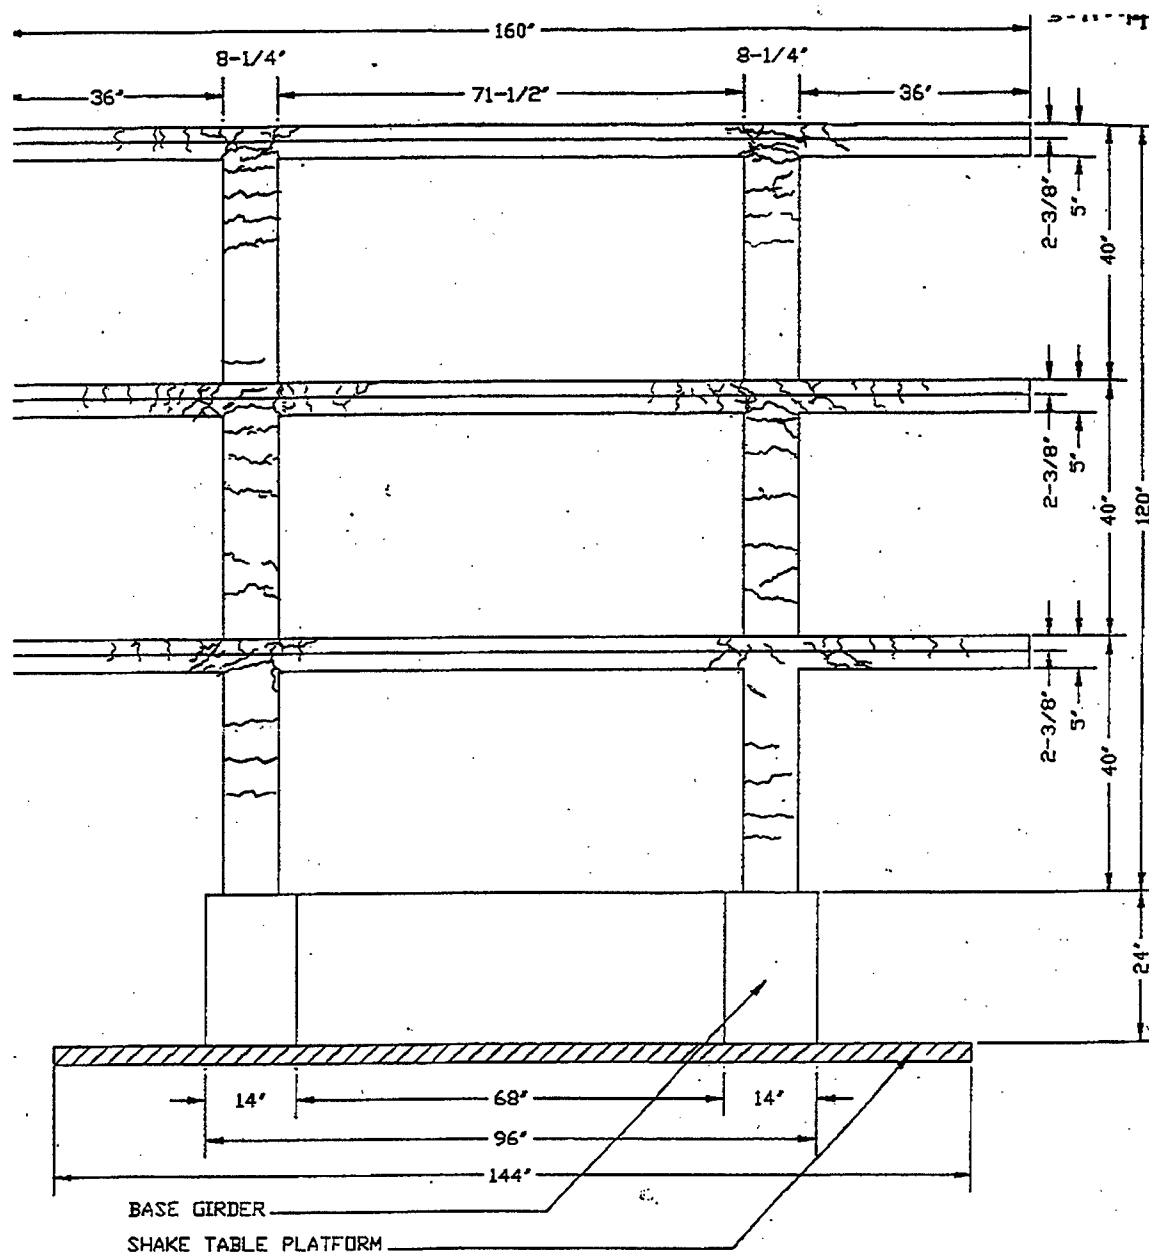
Crack Pattern, South Side of South Columns, Post-T420DL
